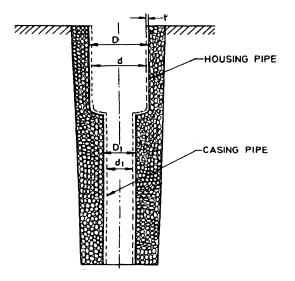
TYPICAL SKETCH SHOWING HOUSING PIPE AND CASING PIPE
